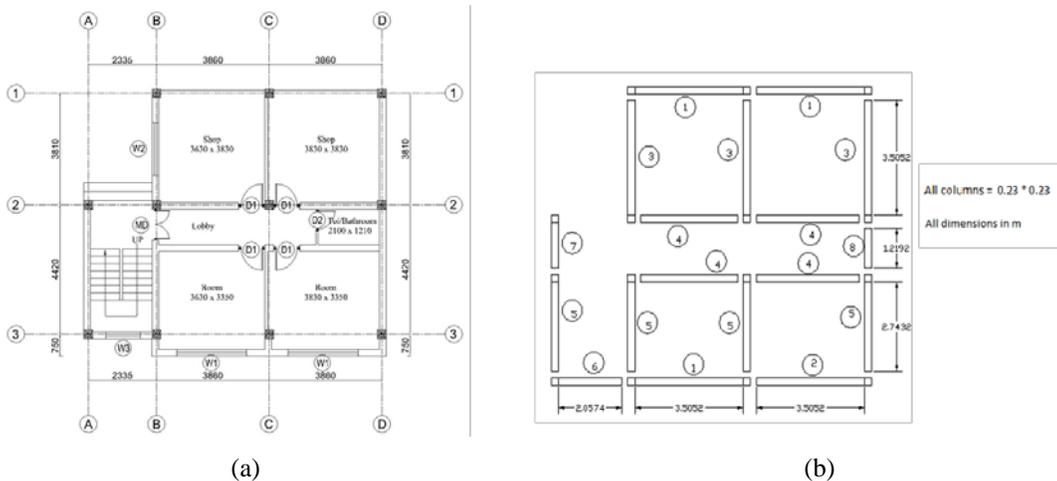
Floor plan of Building 1: (a) Original RC frame with infill (b) Equivalent confined masonry
